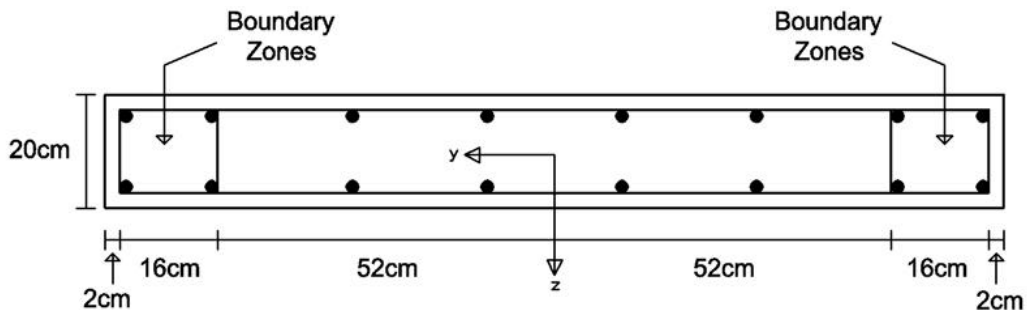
Cross-Sectional and Reinforcement Details of the Shear Wall
